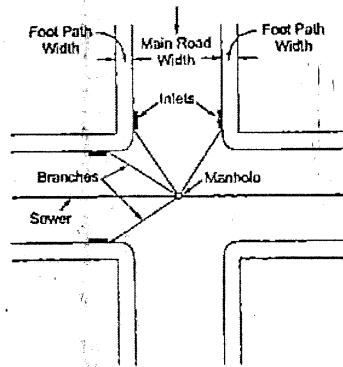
Showing the locations of storm sewer inlets at street intersections.
